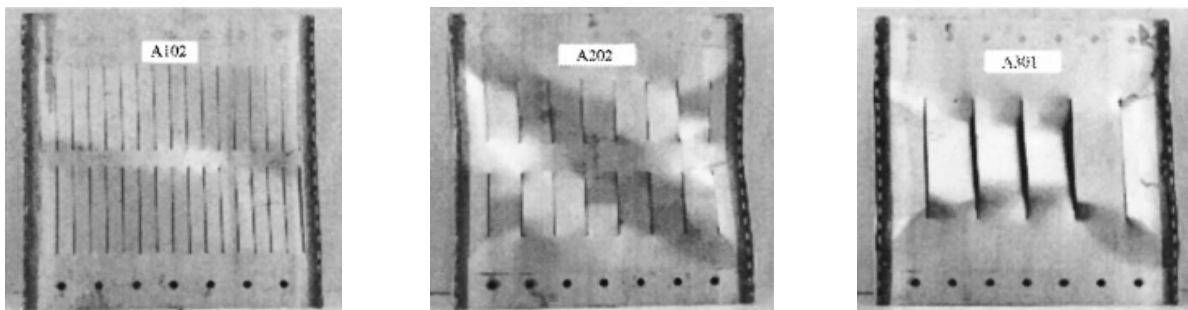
SPSWs with steel slit walls (Hitaka and Matsui, 2003)
